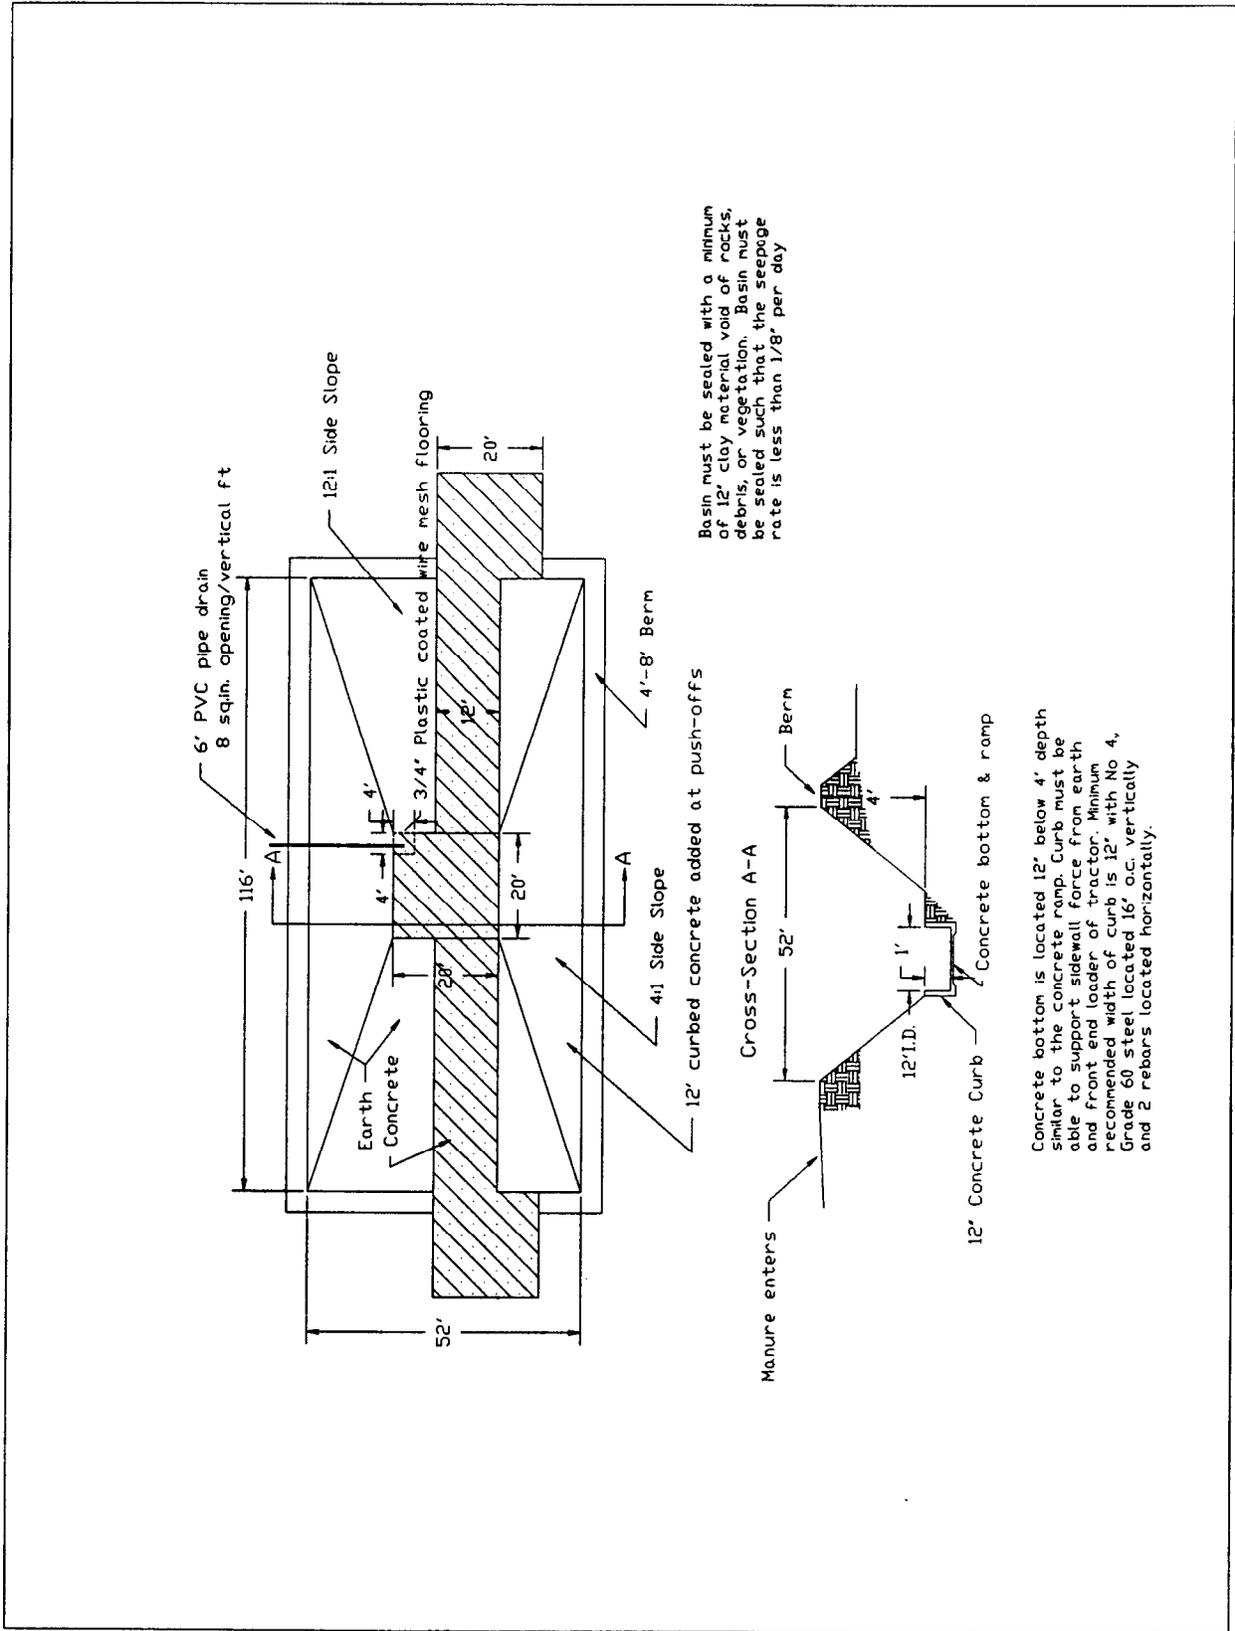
Concrete Bottom and Earthened Sidewalls with Concrete Entrance Ramps
